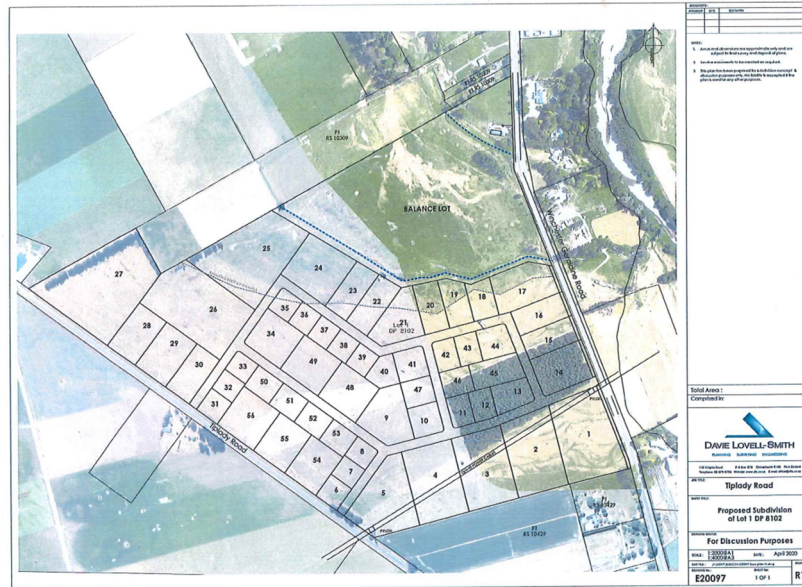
“Preliminary Subdivision Layout”, Infrastructure Investigation Report 2020 (Appendix E)
